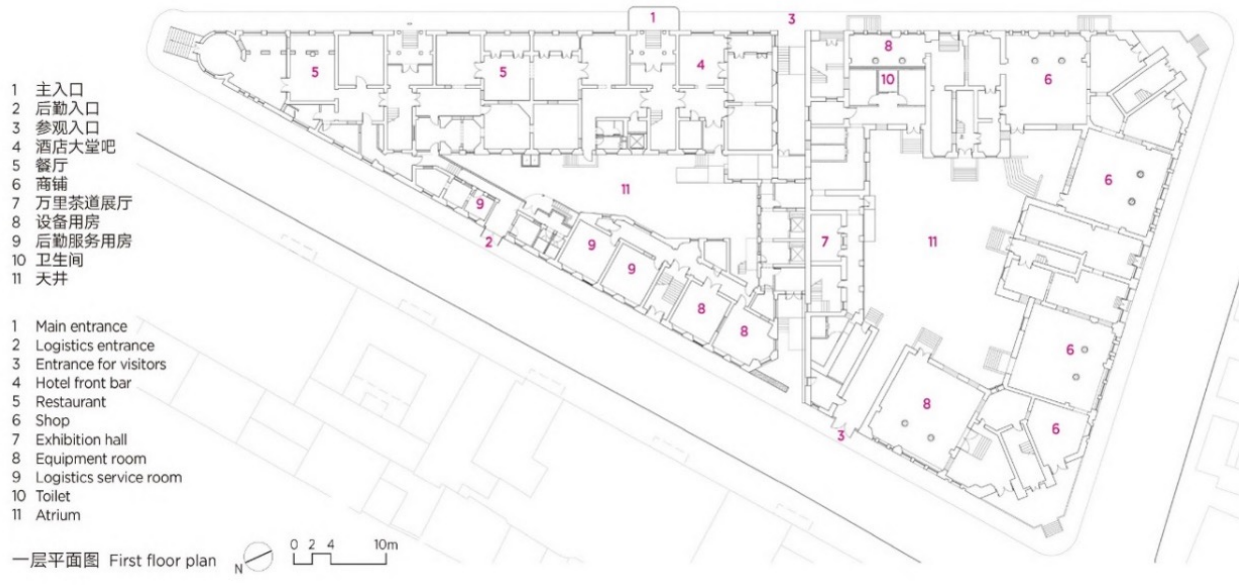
First floor plan of Panoffs' Mansion after the rehabilitation project
